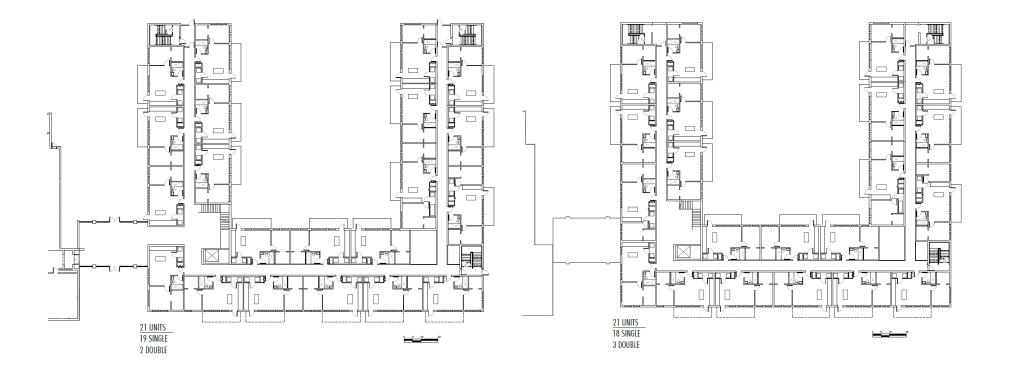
John Grace Arms Senior Housing – Standard Units (Above) Barrier-Free Units (Below)
